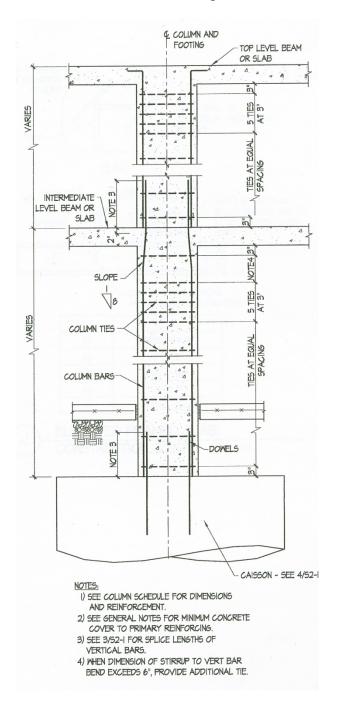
Typical Column Caisson Connection and Column Reinforcing
